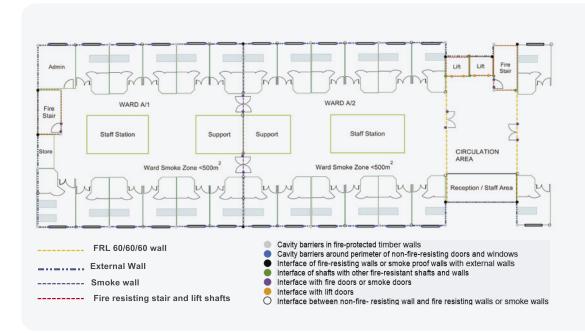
Floor plan section of a Ward area of a Class 9a building showing typical cavity barrier locations.
